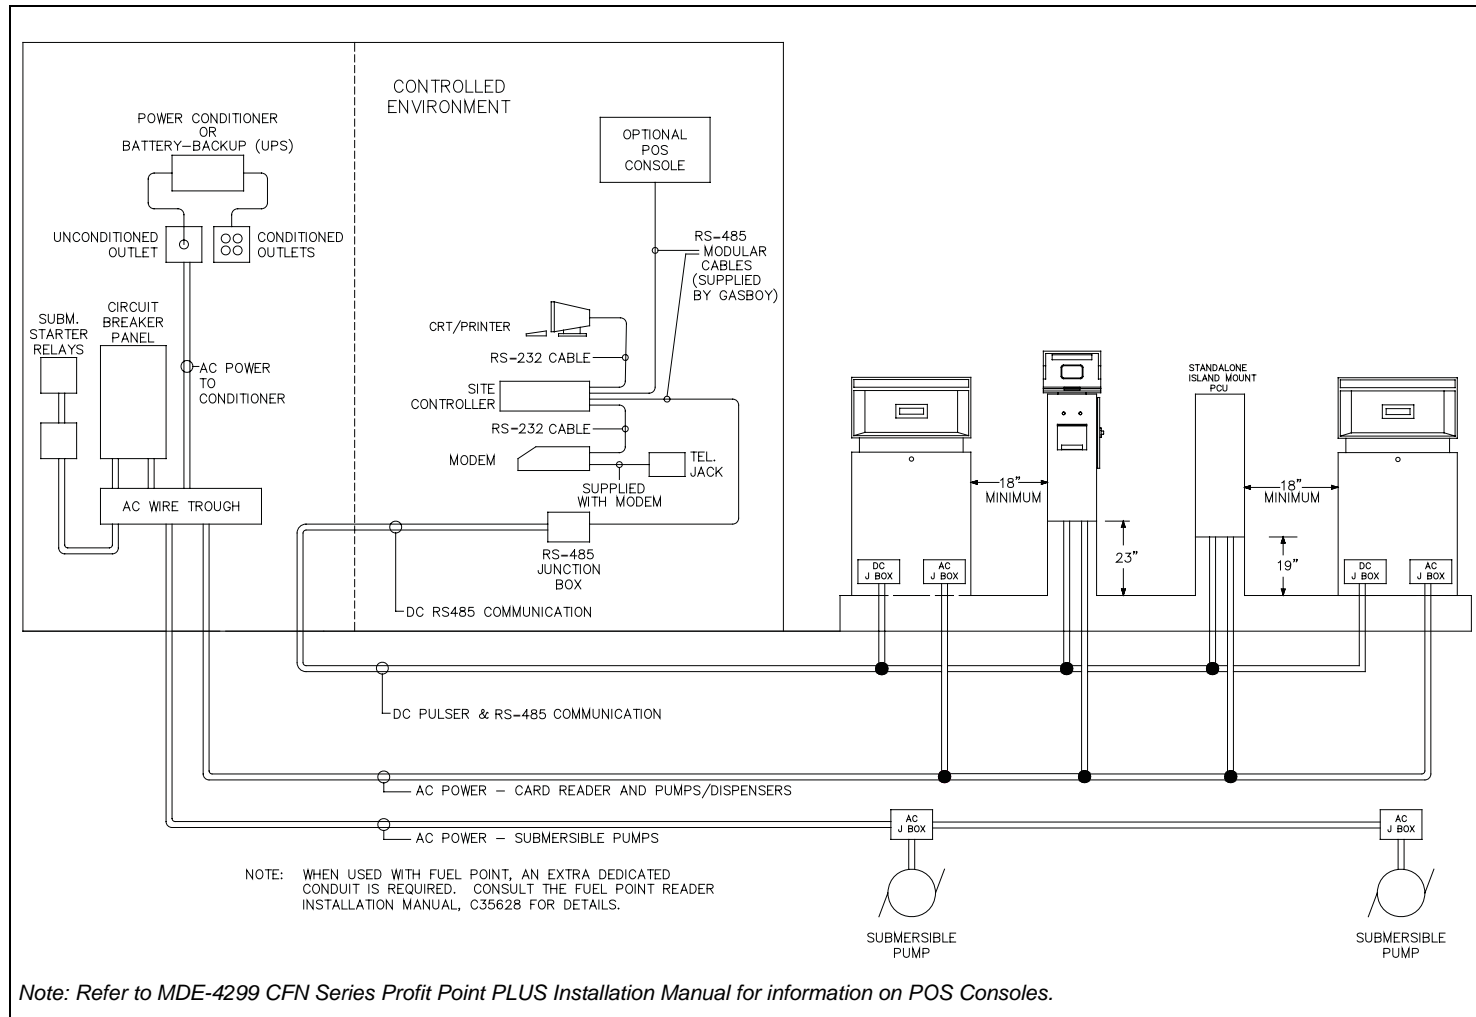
Conduit Layout - Standalone Pump Control Post, Mechanical Hose Outlets
